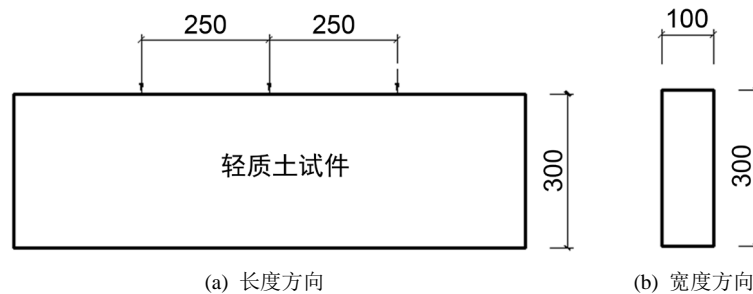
Schematic diagram of load arrangement and specimen width (Unit: mm)
